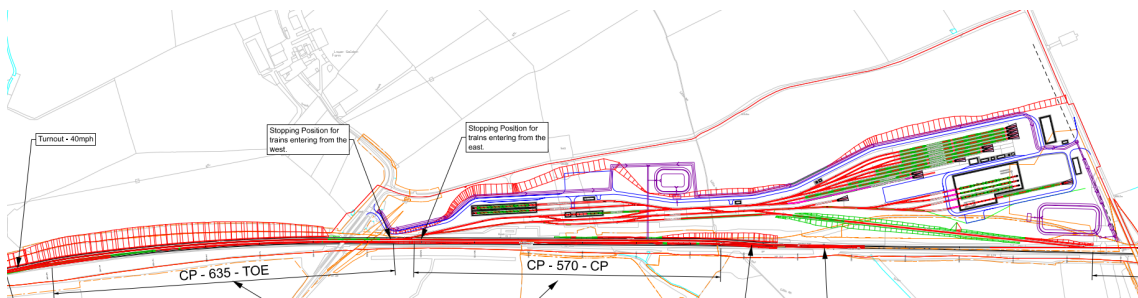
Updated site layout used in re-assessment of Site WQ West of Whaddon Road
